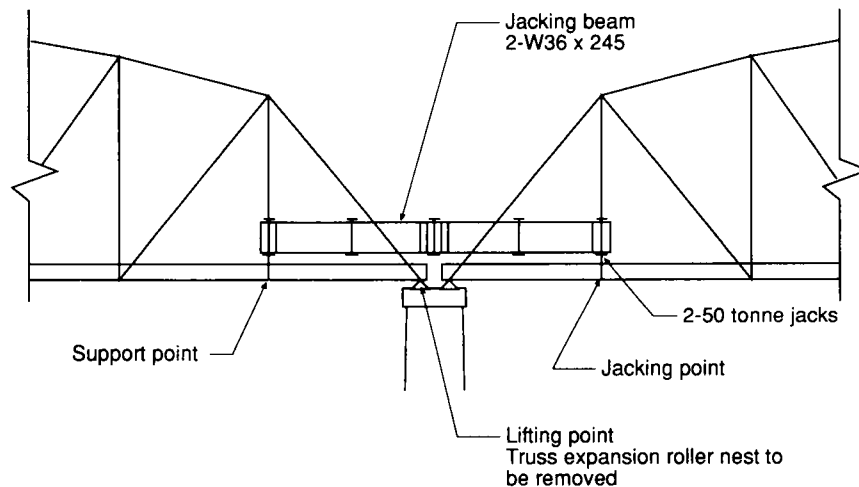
Case Study 2: elevation of jacking scheme, Snohomish River Bridge.
